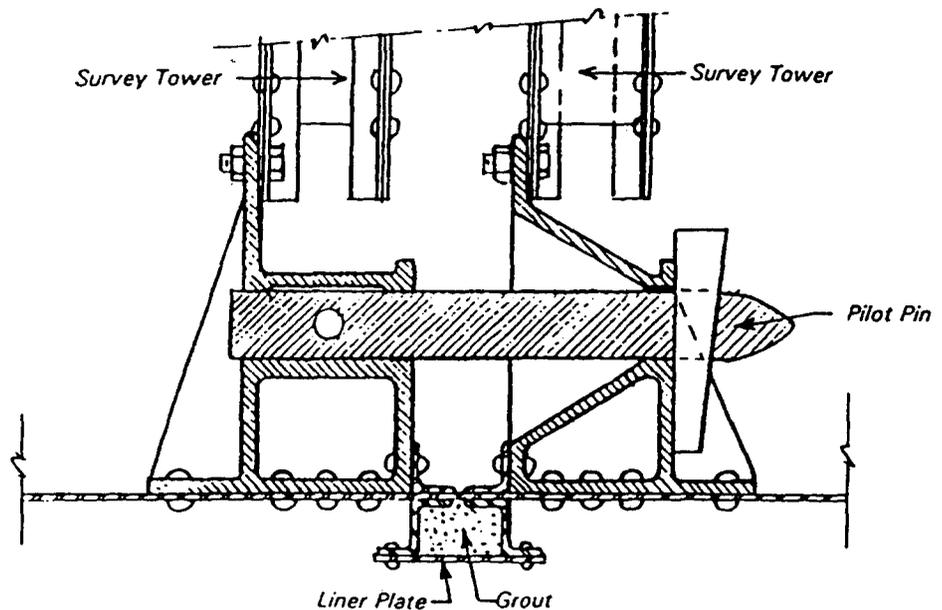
Joint detail for the Harlem River Tunnel (1914).
